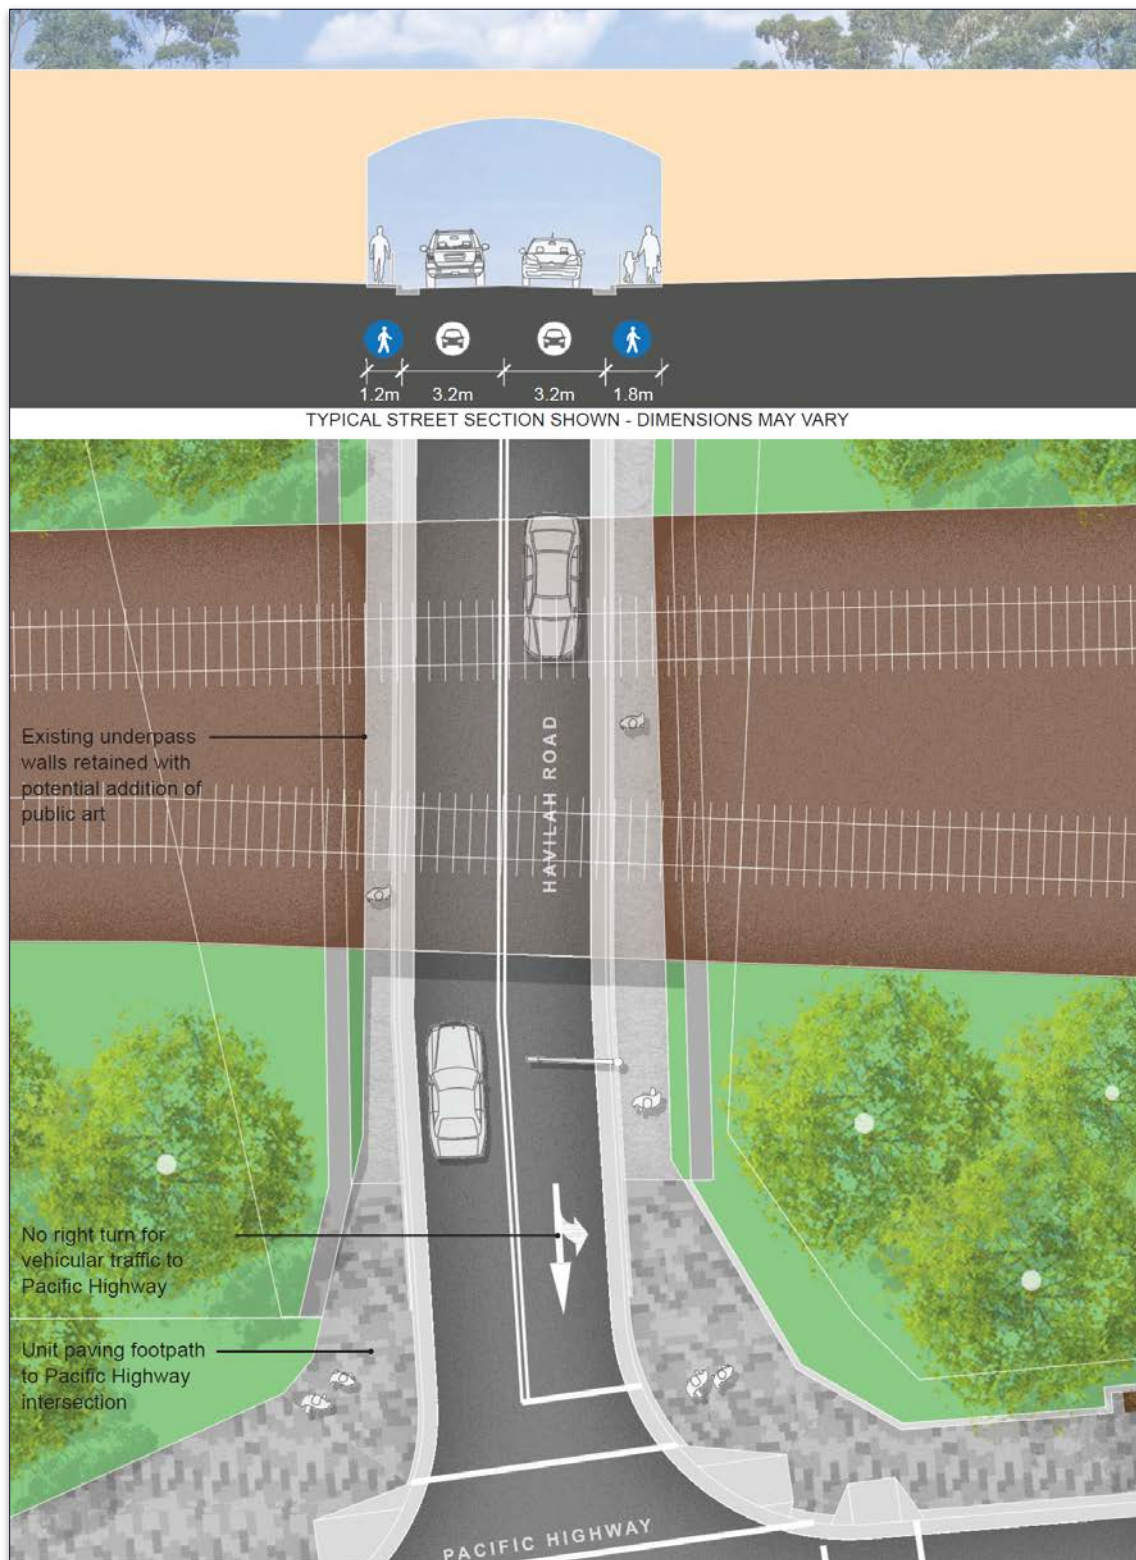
Lindfield Public Domain Plan – Havilah Road
